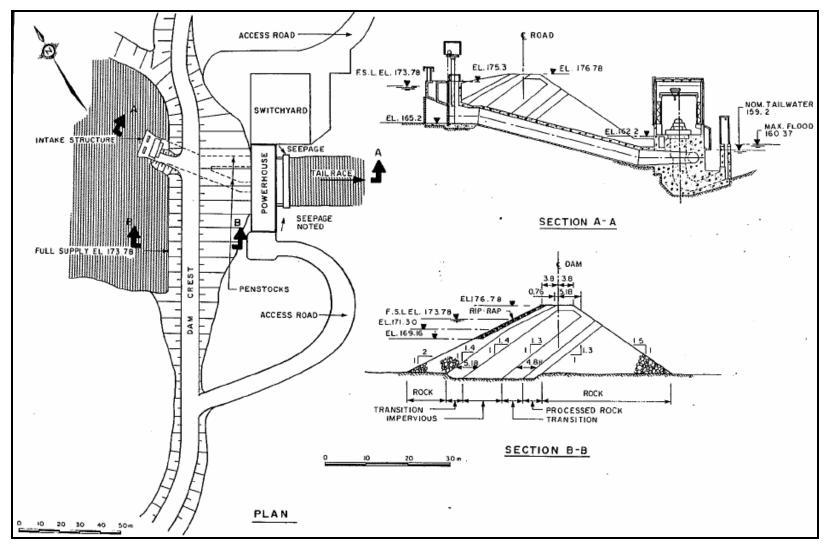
Snare Forks – Strutt Lake Dam, Intake and Powerhouse
